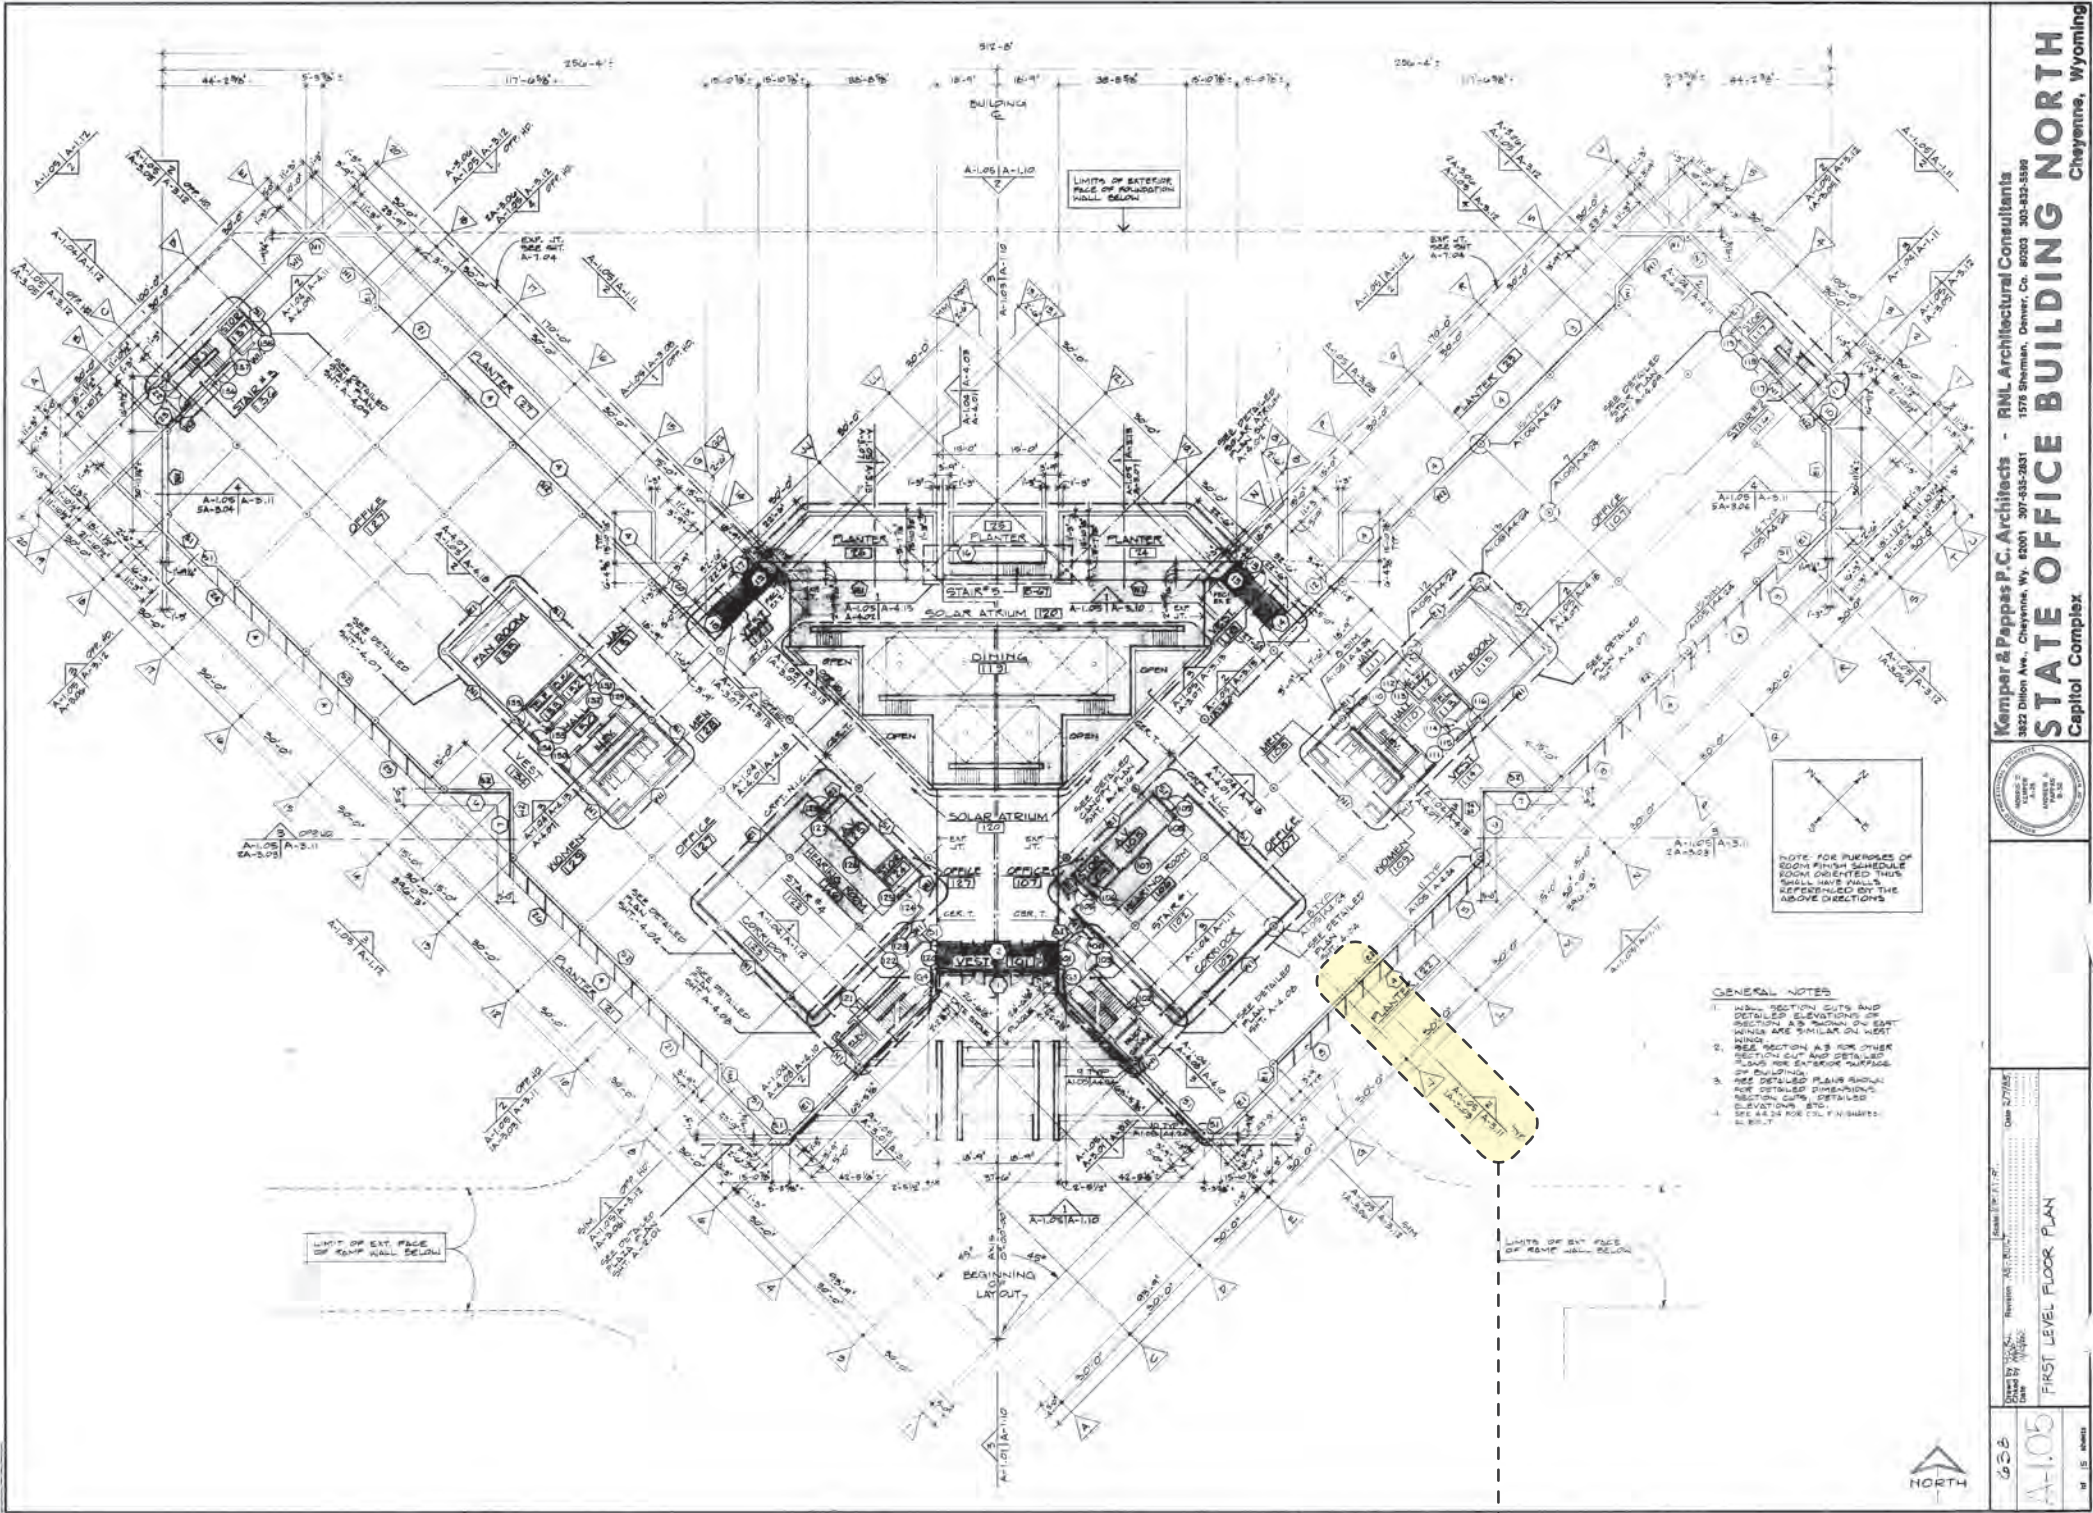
Existing Herschler Building - First Level Floor Plan
